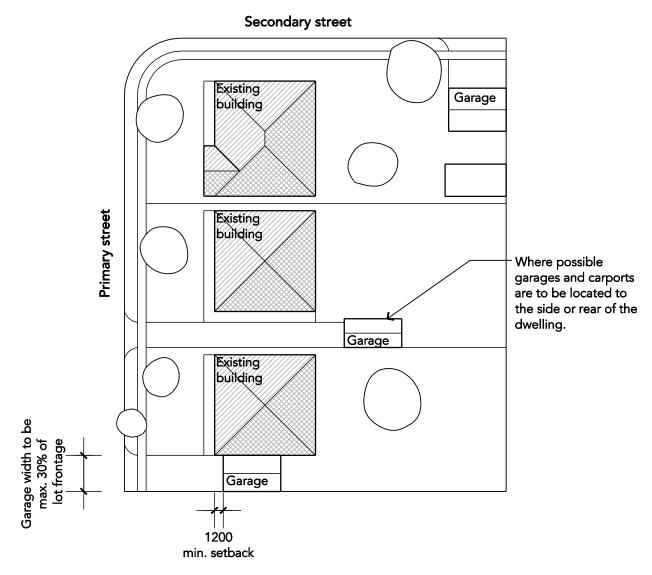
Site plan illustrating compatible garages in residential developments – Griffiths Architects 2012.
